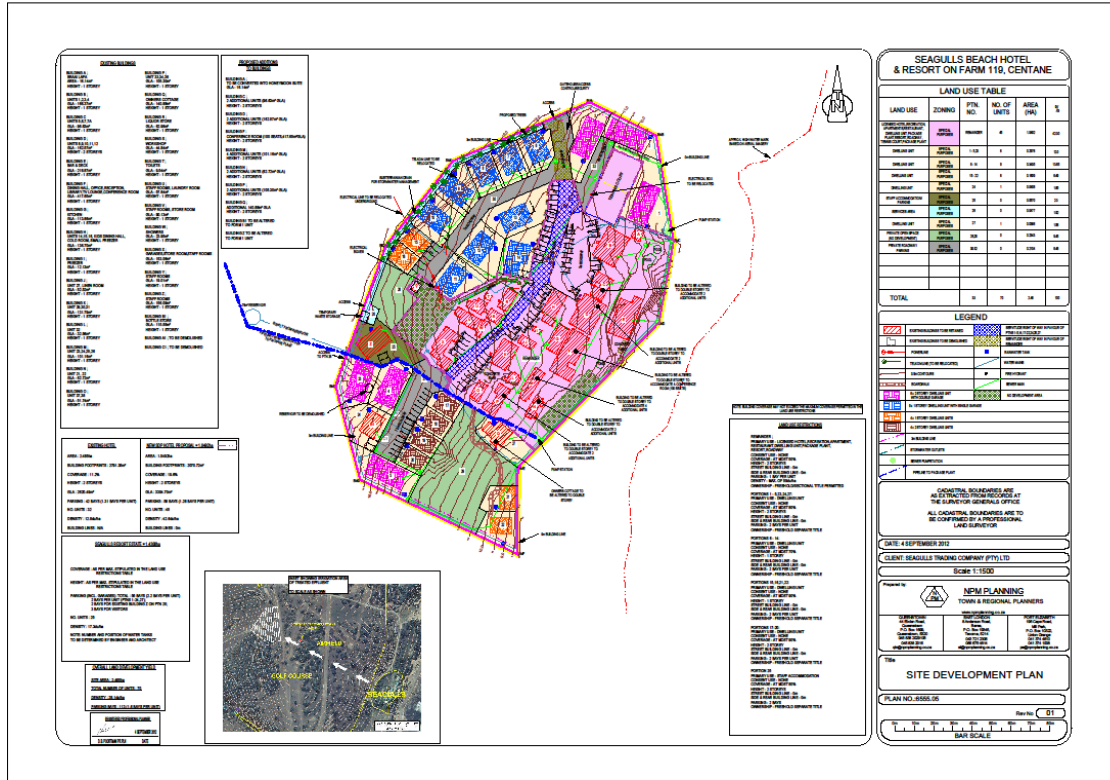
Preferred Site Layout Plan - Alternative A1 (Plan No: 6555.06 Revised 01)
